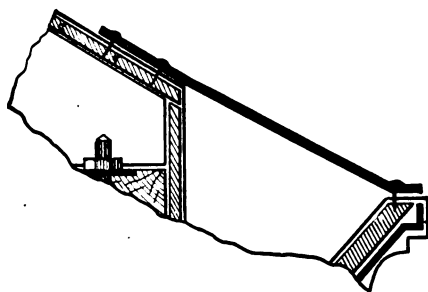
Part Section of Gutter, Showing Top Brace.
